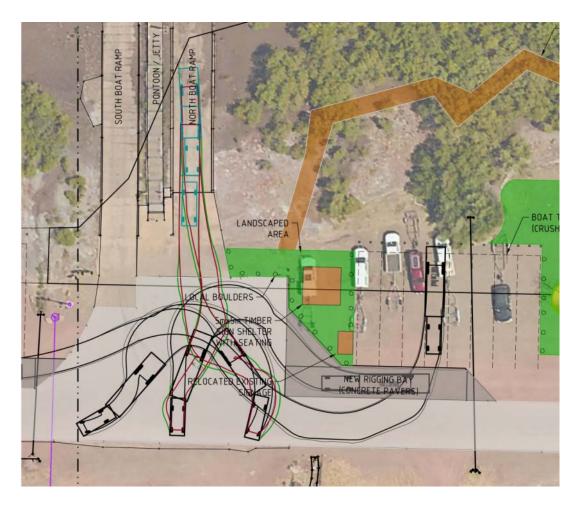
Turning Manoeuvres for 4-Wheel Drive Vehicle with Trailer
